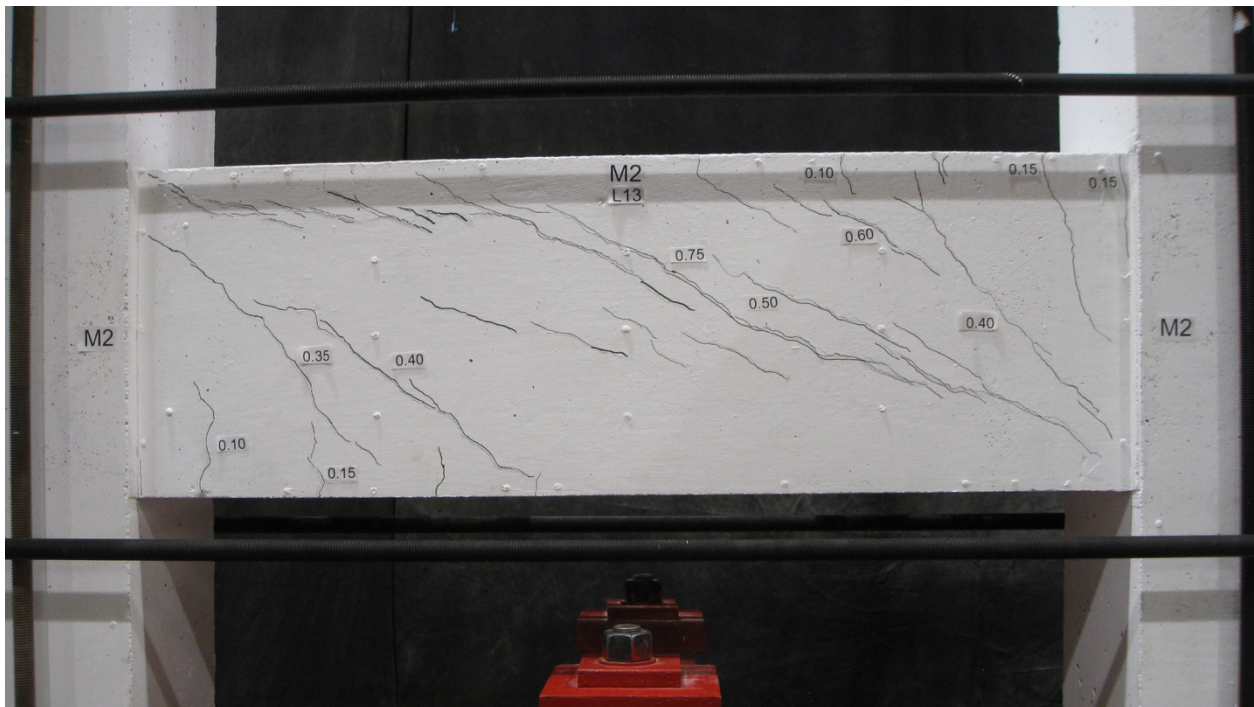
Crack pattern and widths at a shear of 363 kN for specimen M2
